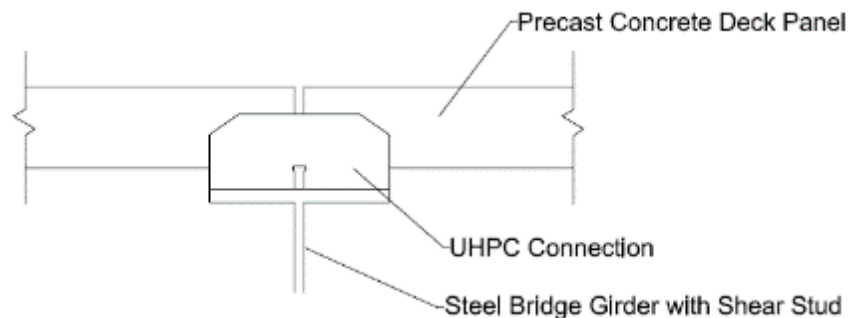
UHPC composite connection detail for steel girders used by Graybeal
